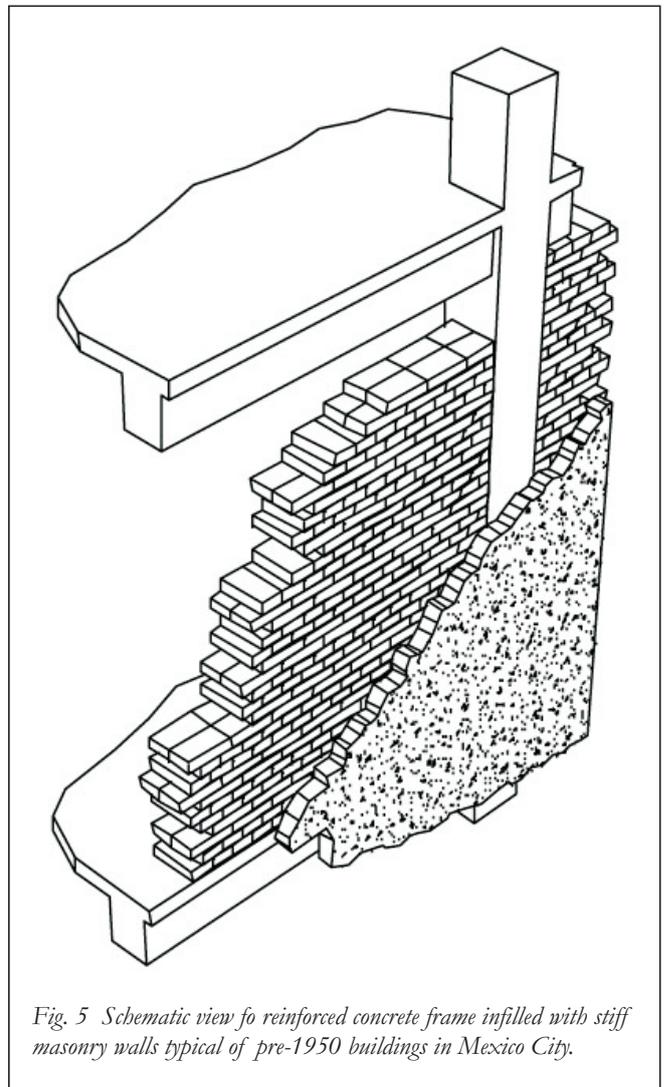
Schematic view of reinforced concrete frame infilled with stiff masonry walls typical of pre-1950 buildings in Mexico City.
